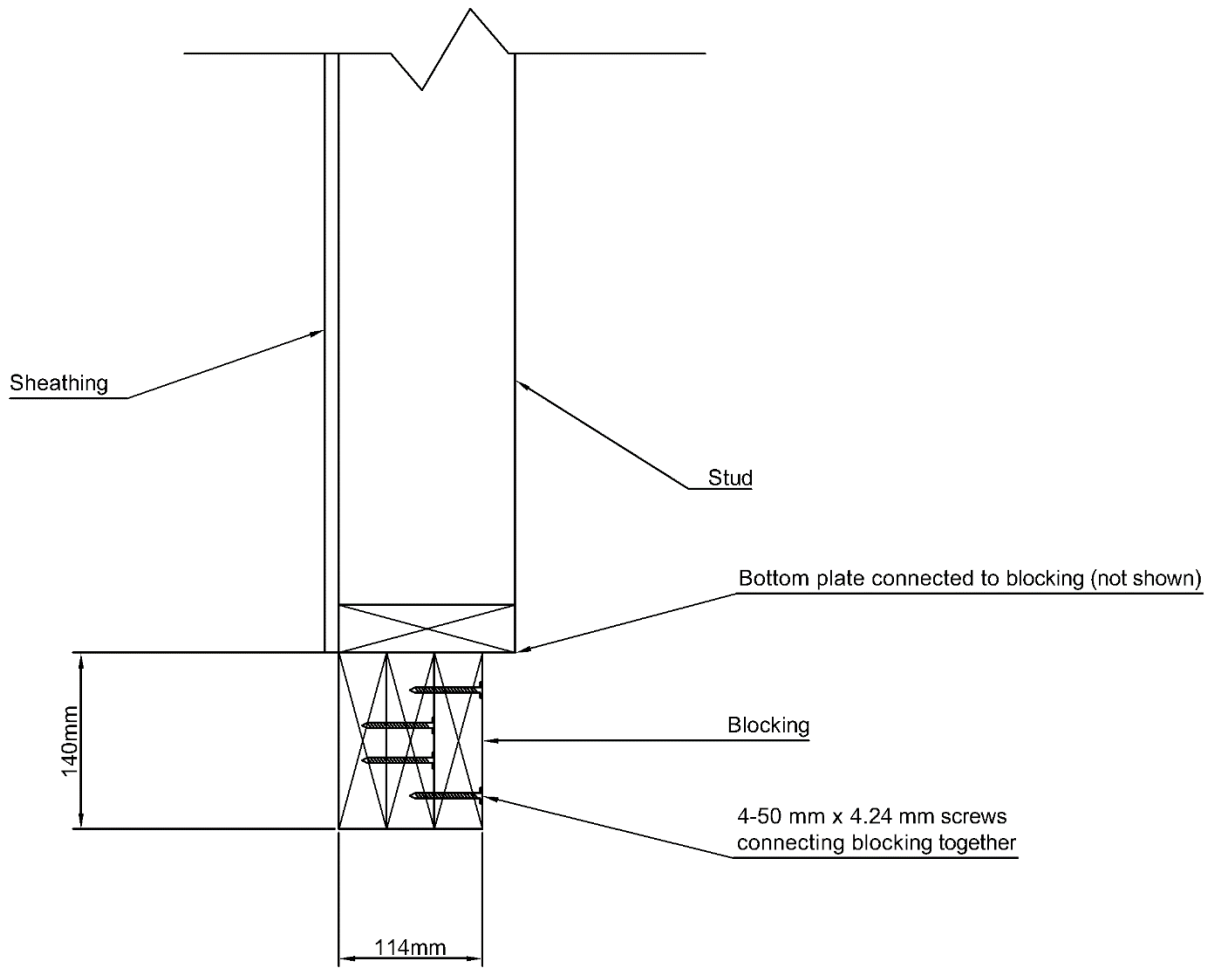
Wall detail for typically and atypically connected walls – side view
